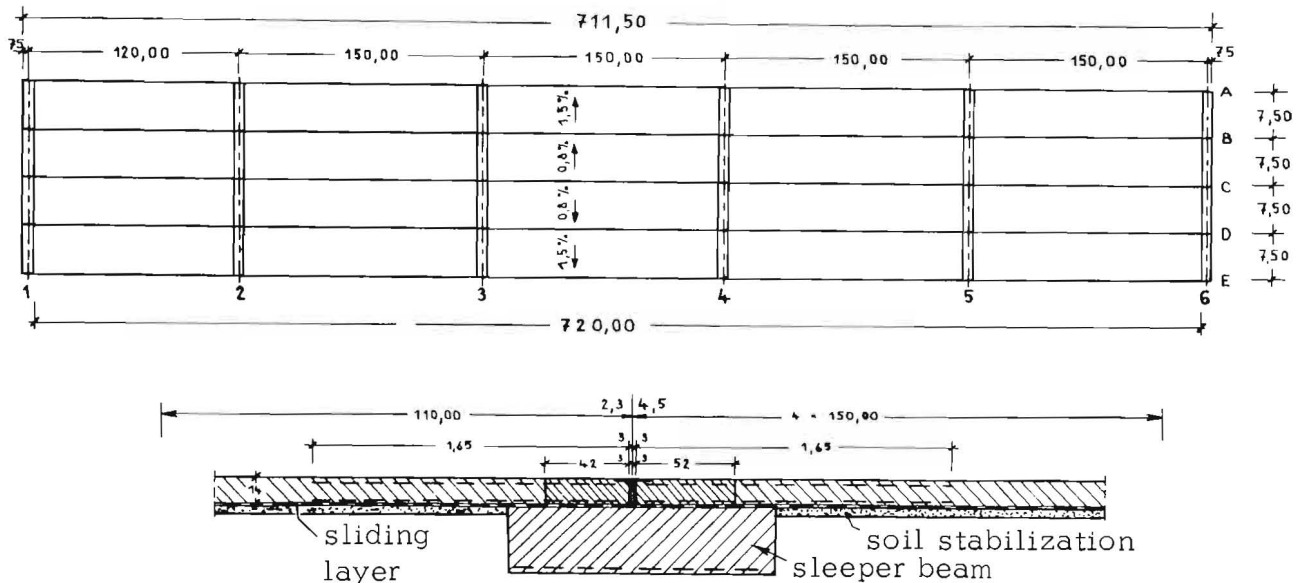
Runway in Lower Saxony. Plan and longitudinal section.
